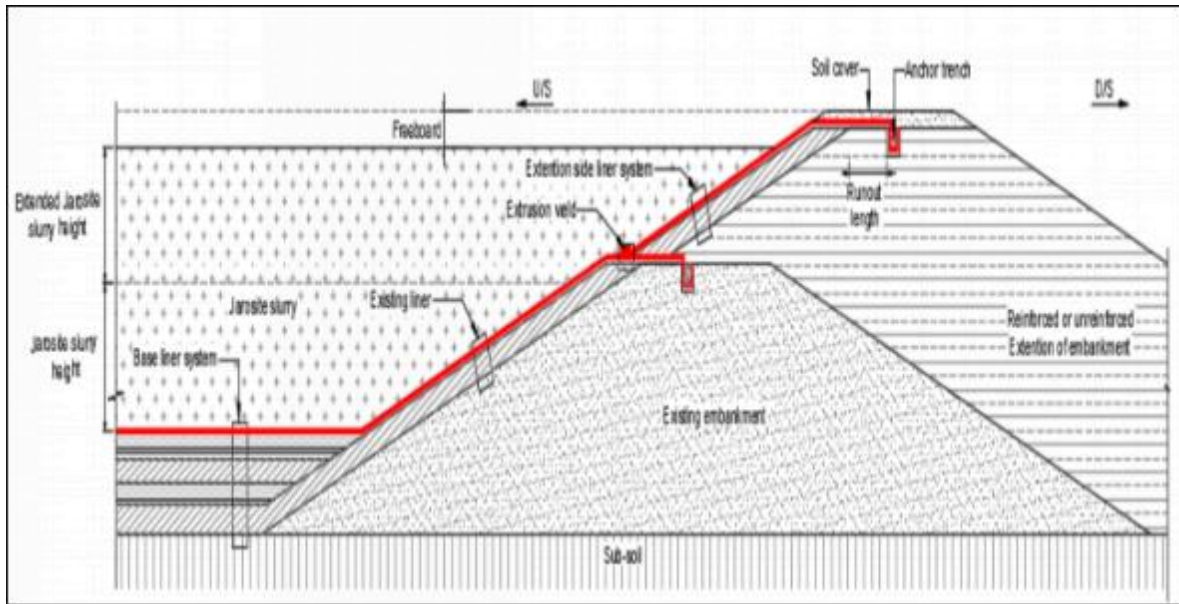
Cross section of Jarosite pond expansion in downstream side, Debari
